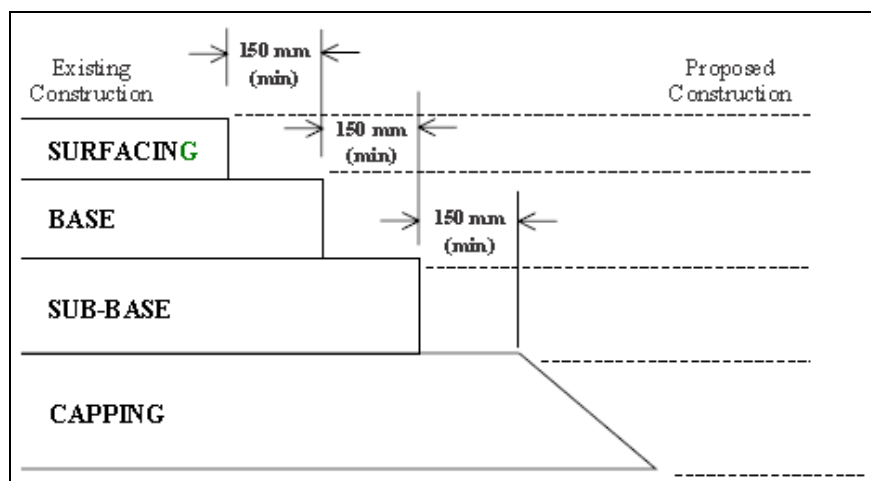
Preliminary drawing of benching at joint (Design Manual for Roads and Bridges)
